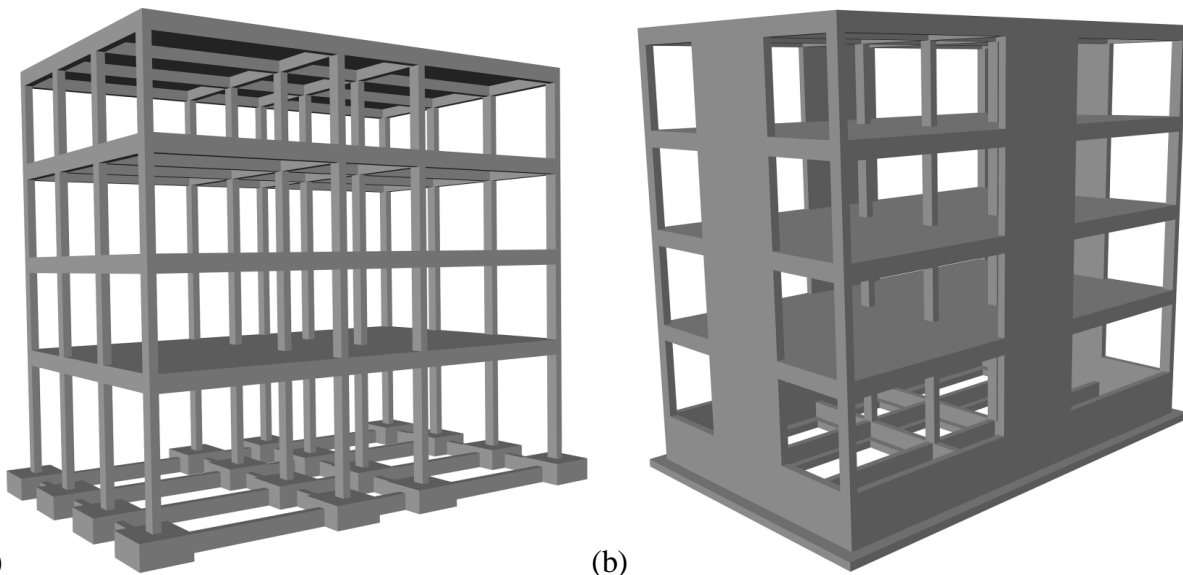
Structural systems: (a) frame resisting both gravity loads and lateral actions, on footings with two-way tie-beams; (b) wall-frame lateral load resisting system on two-way foundation beams.
